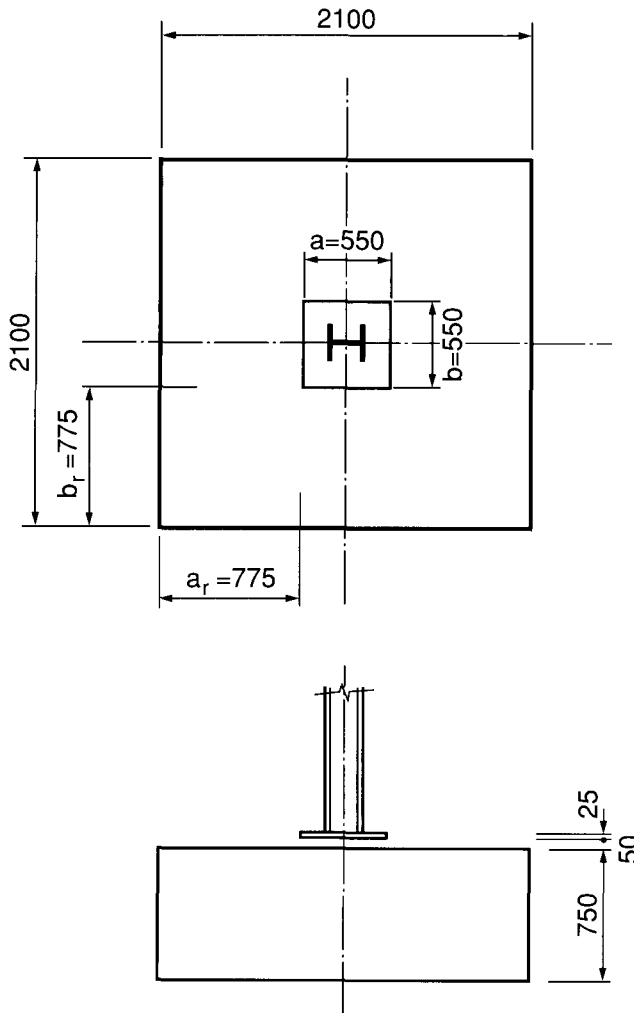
Plan view of base-plate on foundation (dimensions in mm)
